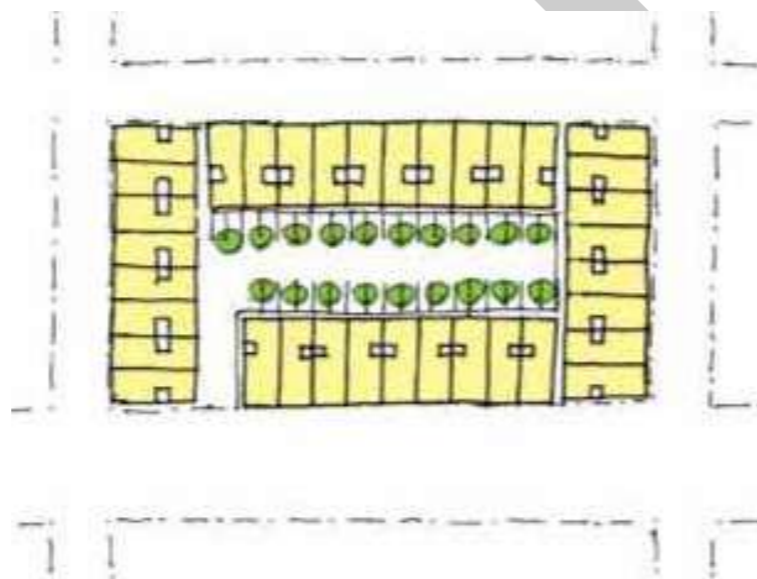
Site development layout sketch showing external parking on Phase 3 duplex units (CNdP, 2022)
